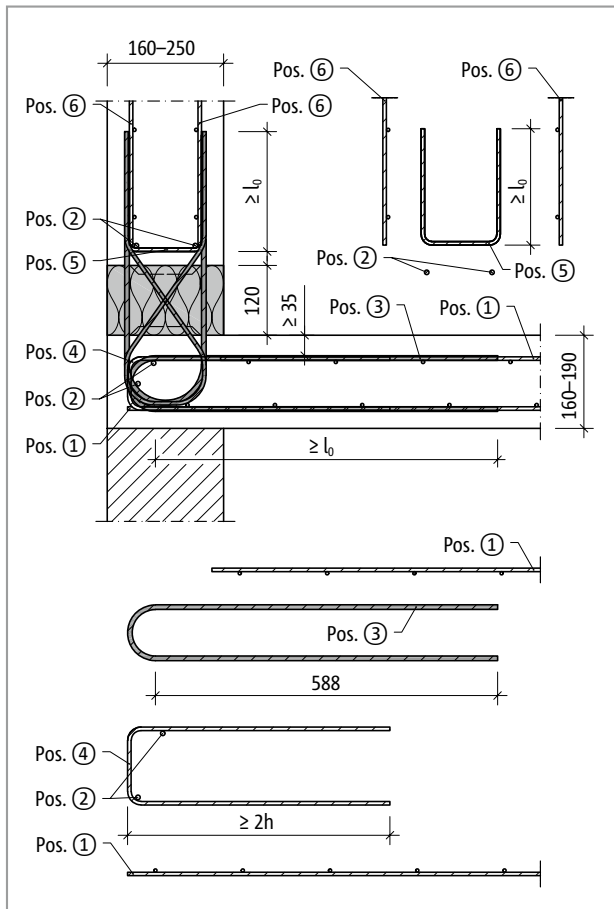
Schöck Isokorb® XT type A: On-site reinforcement inside
